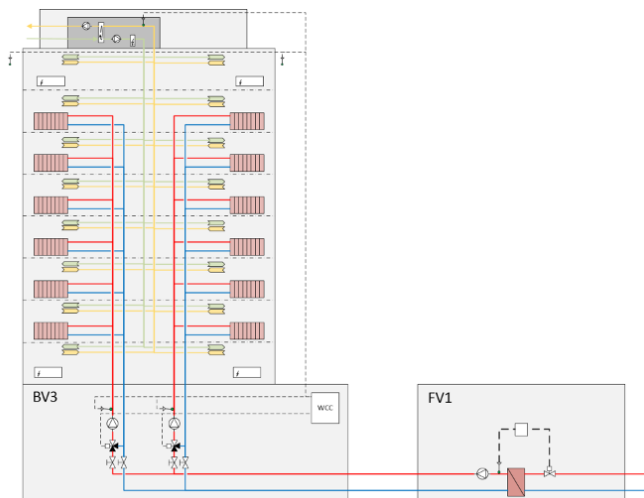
Overview of the building and its systems, as presented by Walnum (2020).
